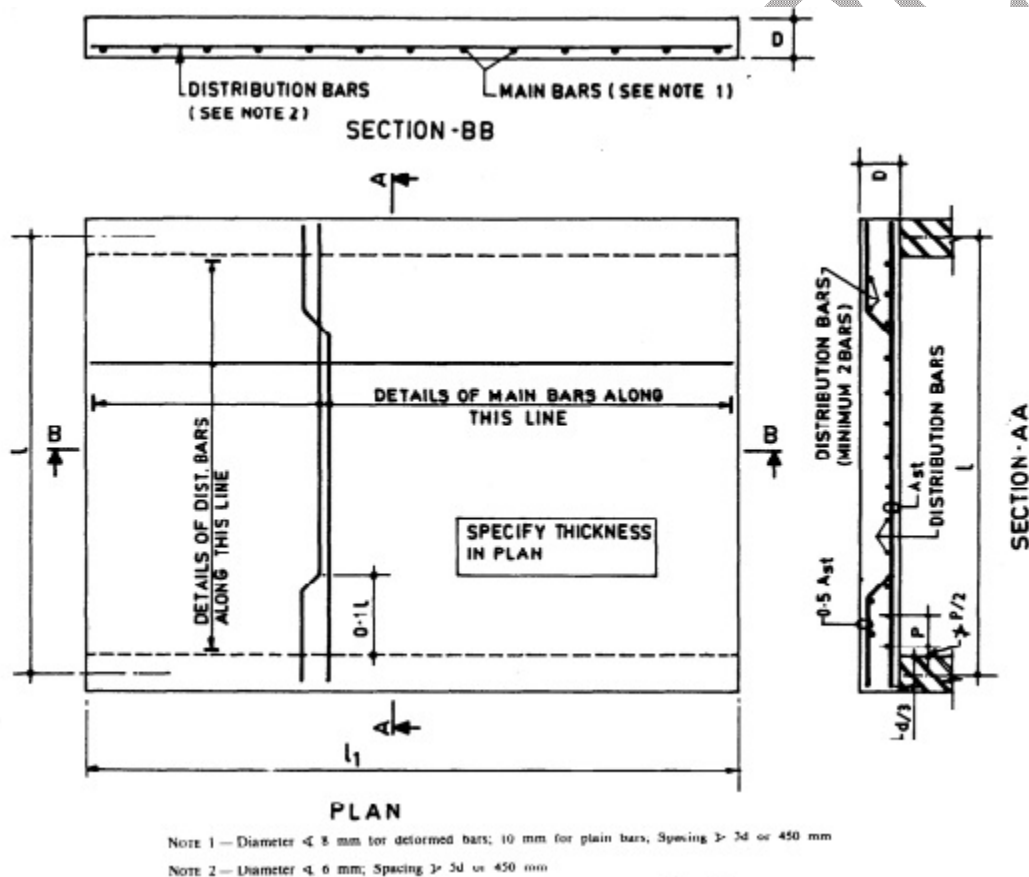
typical detail of simply supported slab resting on wall spanning in one direction
